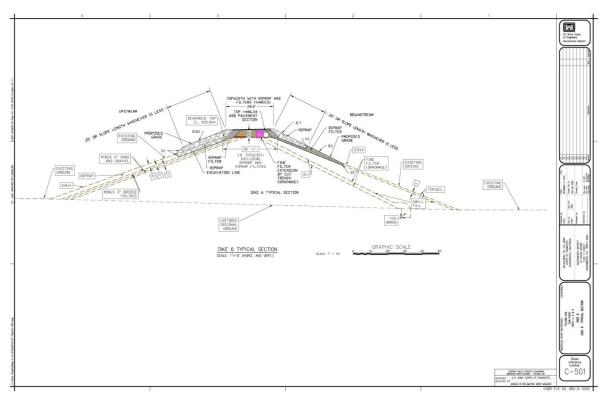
Example Cross Section of A 3.5-foot Earthen Dike Raise.
